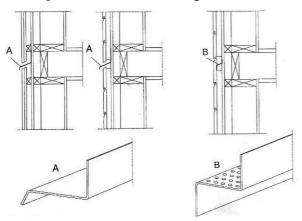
Example of fire stops to be used in a vented outer wall with wooden façade (Trätek, 2002).
